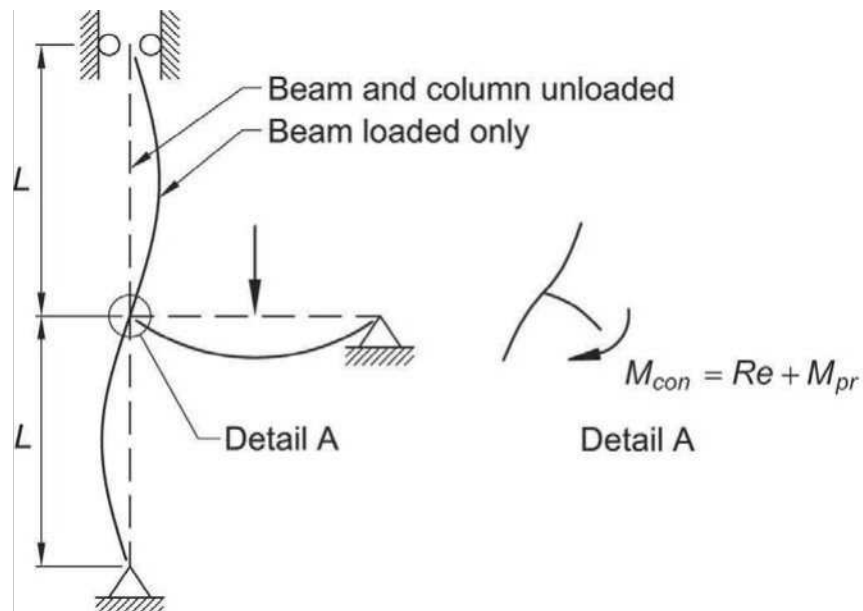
Illustration of beam, column and connection behavior under loading of beam only.
